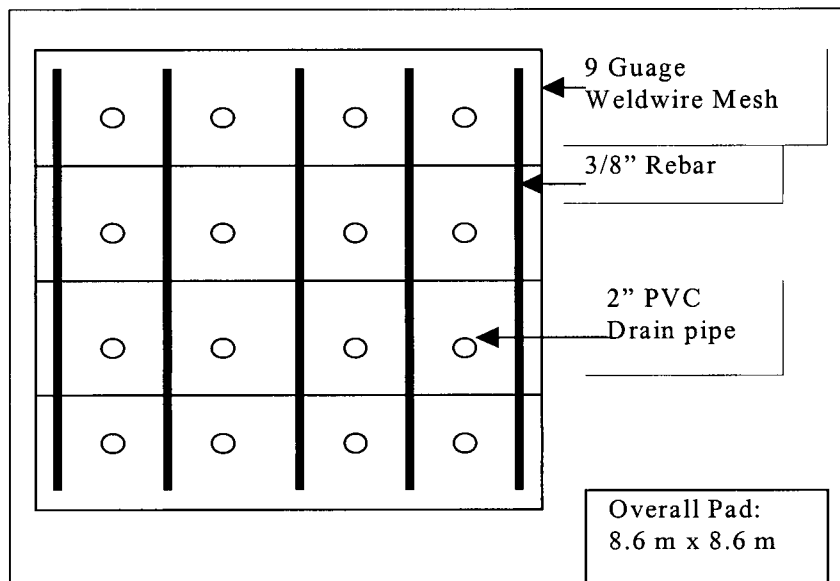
Schematic Plan View of Concrete Pad Reinforcing
